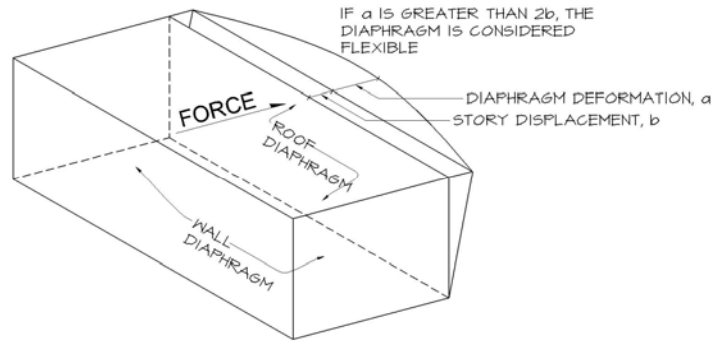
illustrates the basic concept for a roof and wall diaphragm. In Figure 1 wind pressure on the walls parallel to length  $L$  act on the building. A line load reaction of this pressure is distributed to the top of the wall at the roof plane via the vertical spanning capacity of the cladding over height  $H$ . The roof, acting as a simple span horizontal girder of depth  $B$ , distributes the wind line load as a shear reaction along the top of the end walls perpendicular to  $L$ . The end walls in turn act as diaphragms between the roof and foundation levels.
